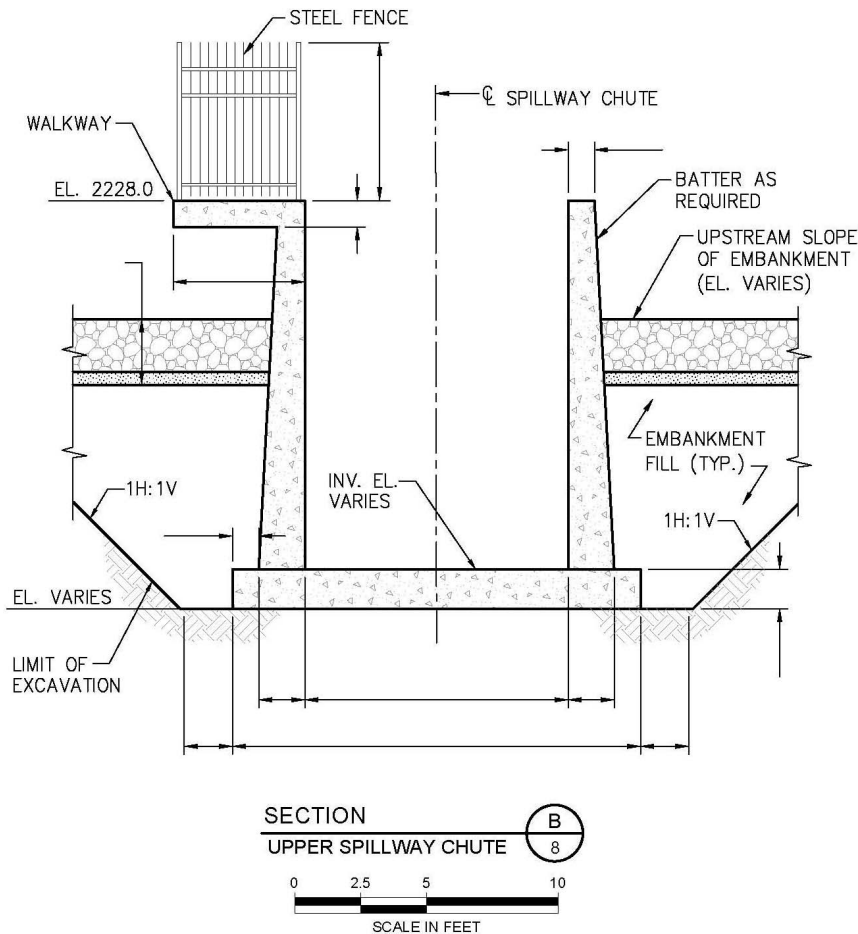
S-19. Dimensioning of Upper Spillway Chute
